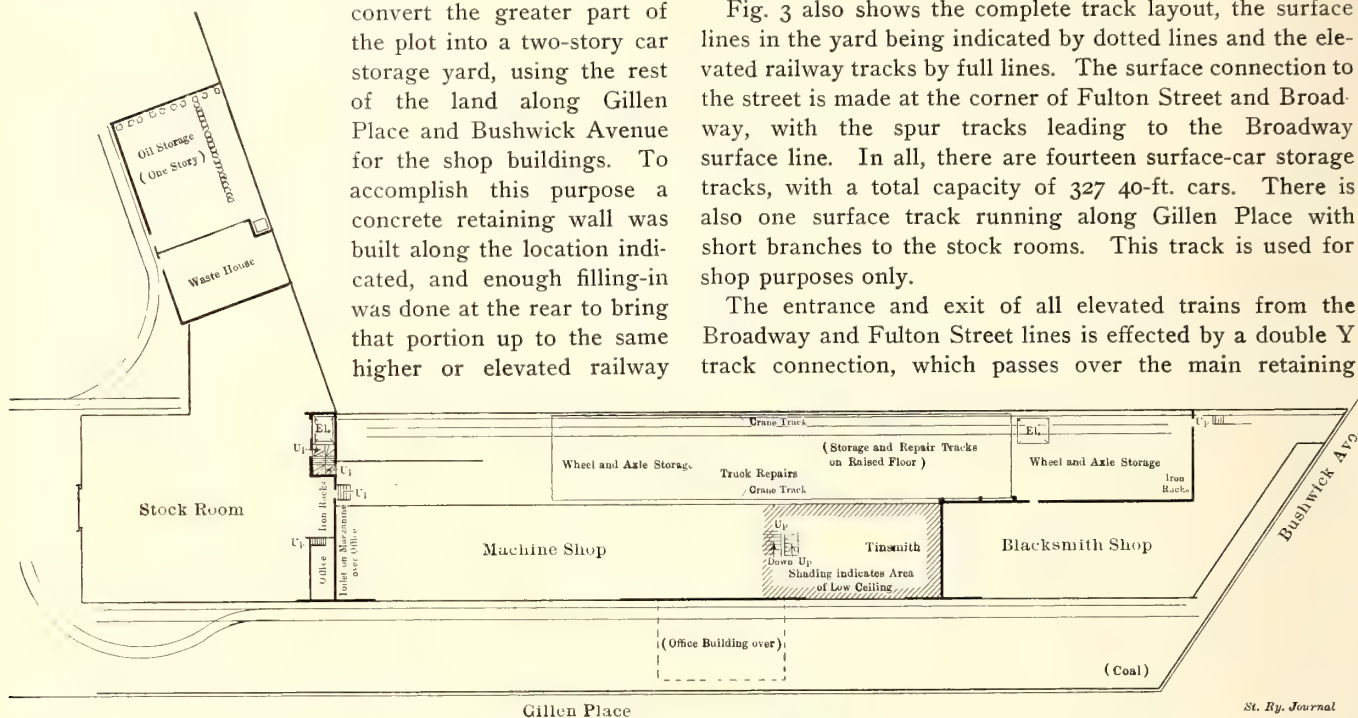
LAYOUT OF FIRST FLOOR OF MAIN SHOP BUILDING AND STORAGE HOUSES, SHOWING THE LOCATION OF THE DEPARTMENTS, SURFACE SUPPLY TRACK, ETC.
